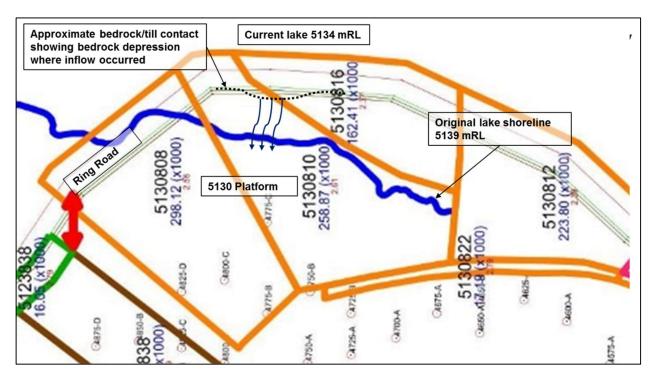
Vault Pit inflow location on 5130 bench, grid east wall
